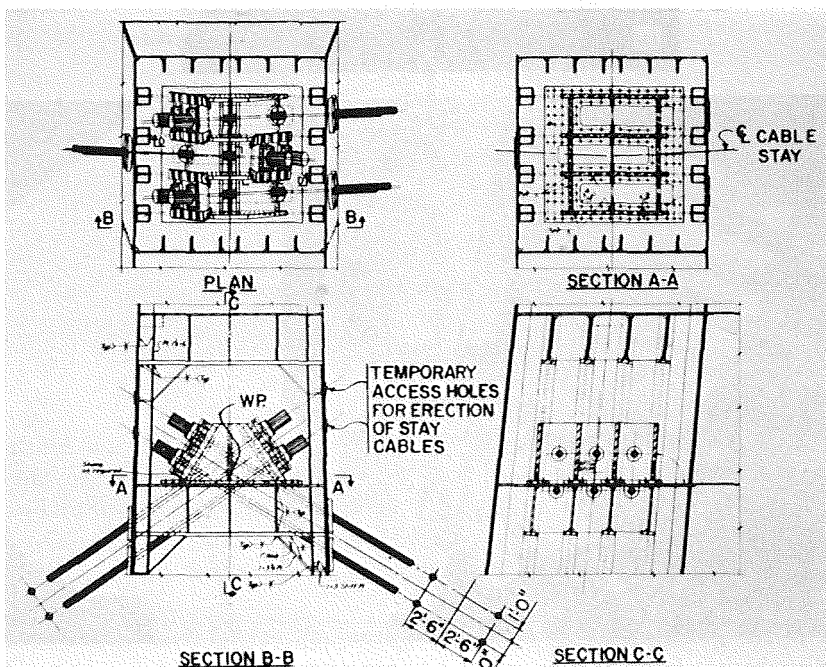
Luling Bridge, anchorage connection detail at pylon, from reference 22.)
